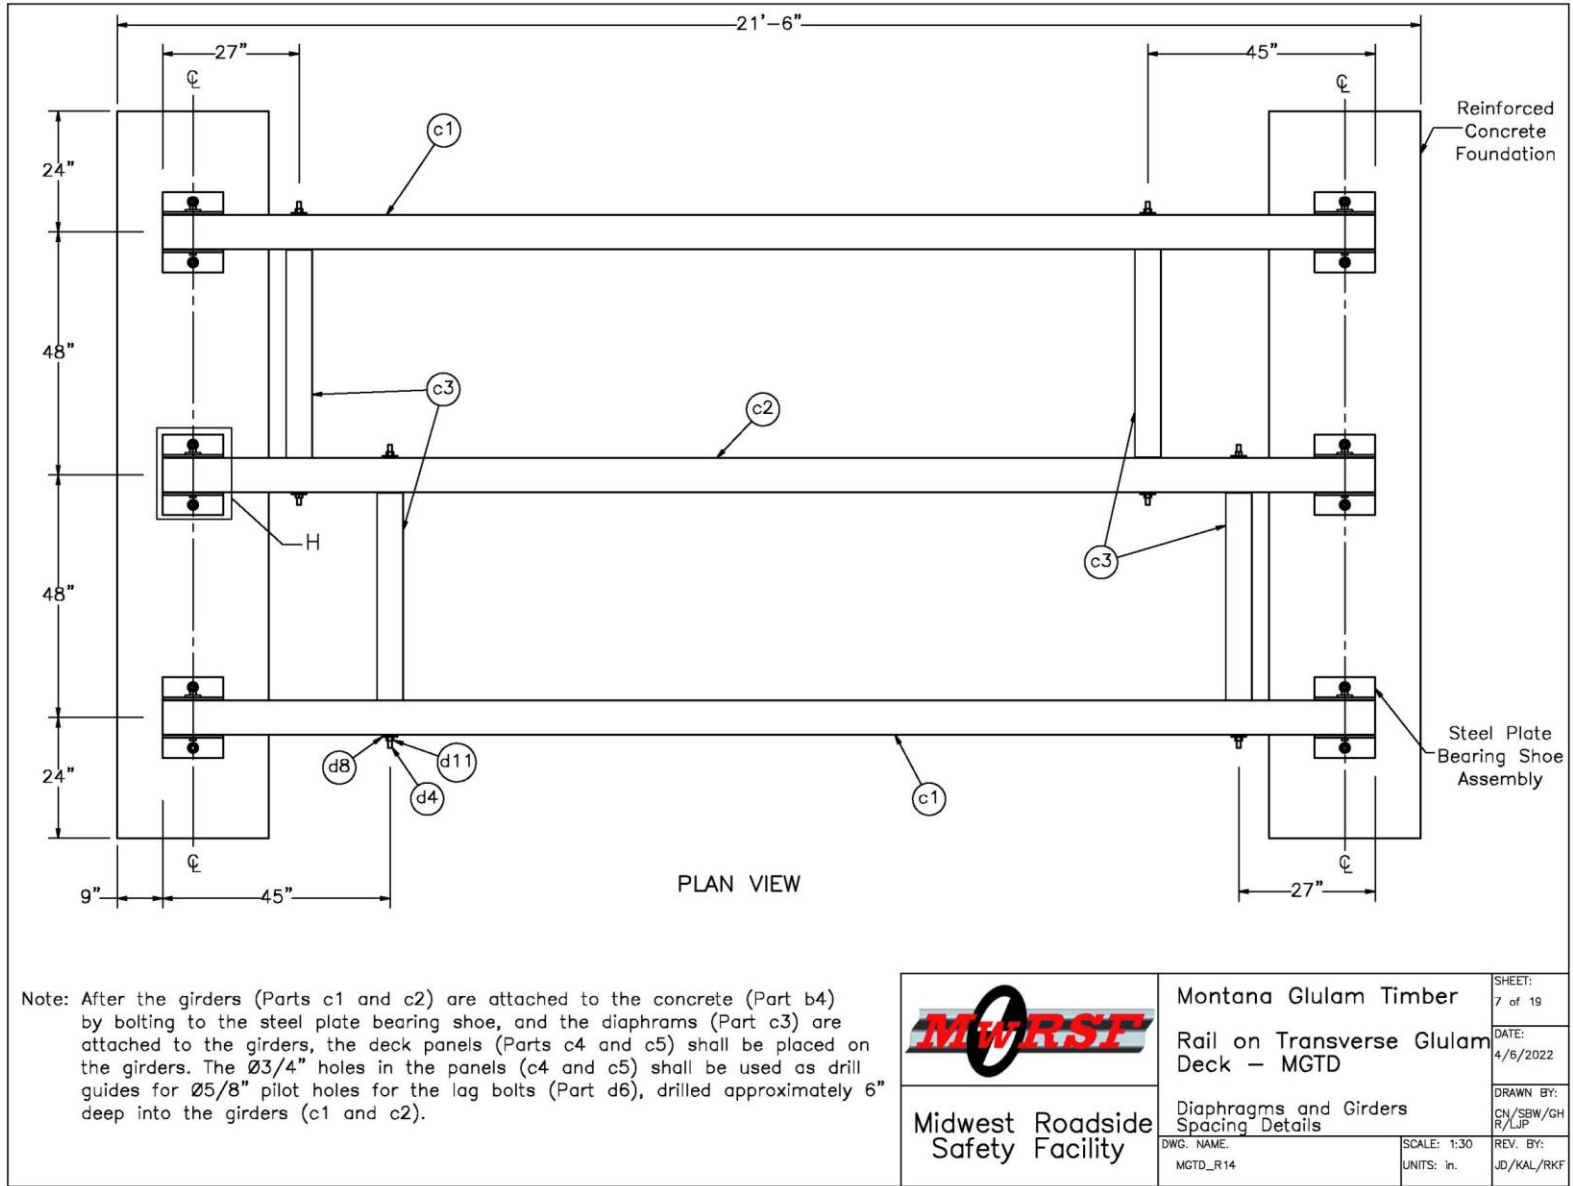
Diaphragms and Girders Spacing Details, Test Nos. MGTD-1S and MGTD-1D
